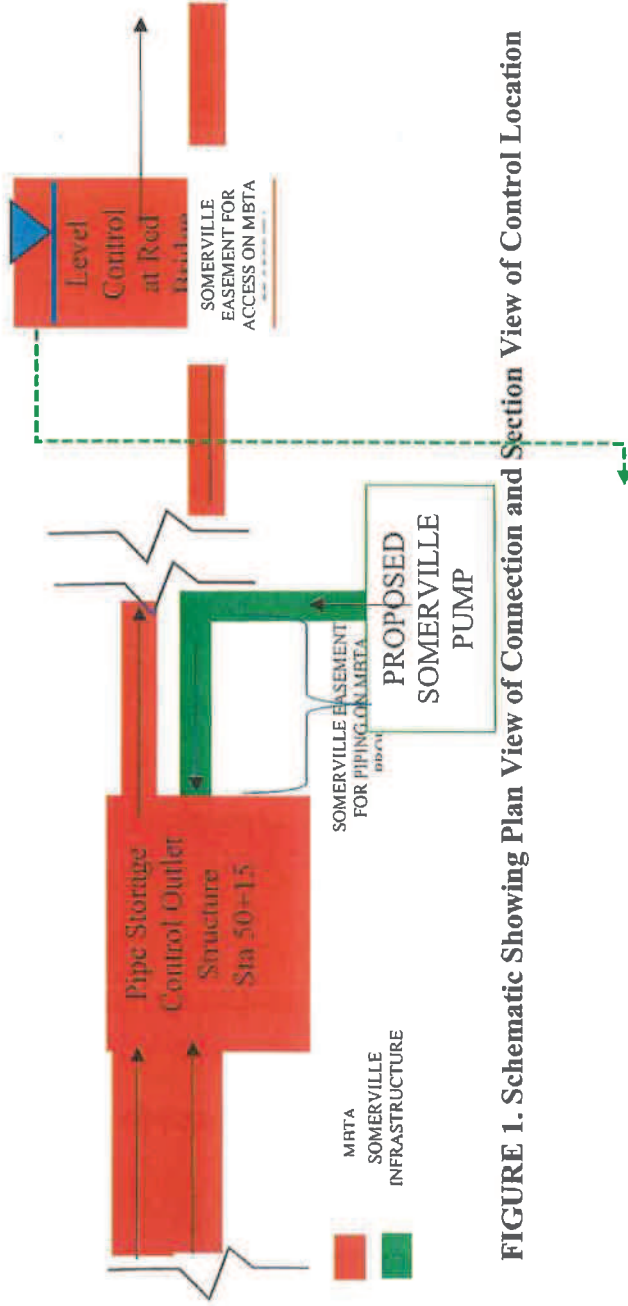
Schematic Showing Plan View of Connection and Section View of Control Location
